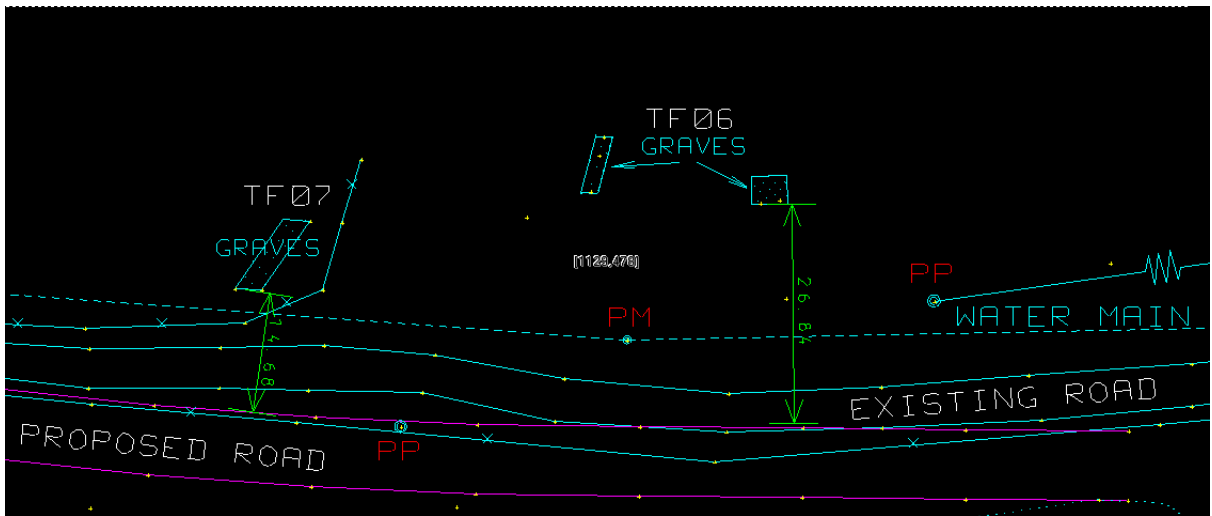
Position of grave sites TF07 and TF06 adjacent to the new road alignment (Source: Neil Brand)
